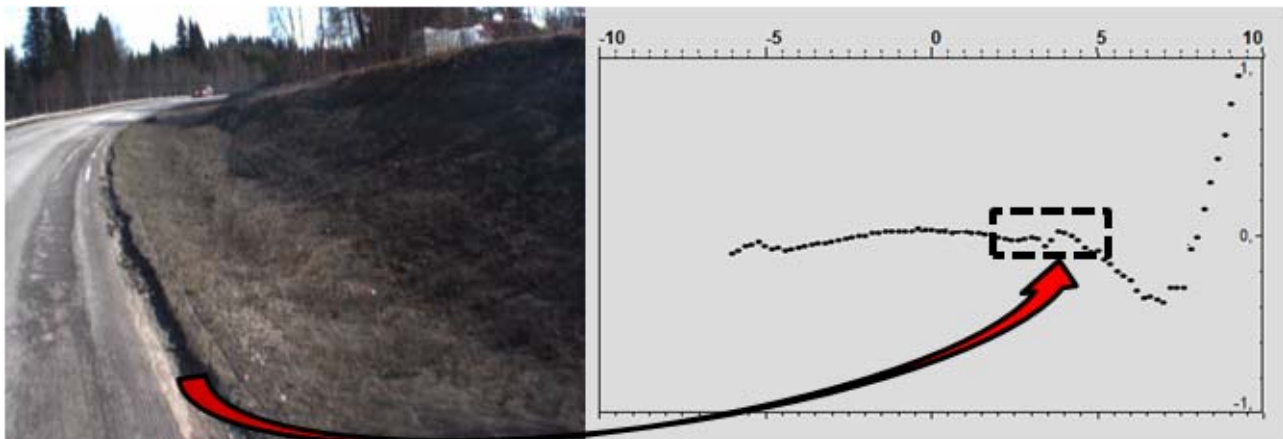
Erosion damage on the edge of the pavement at chainage 5840m
